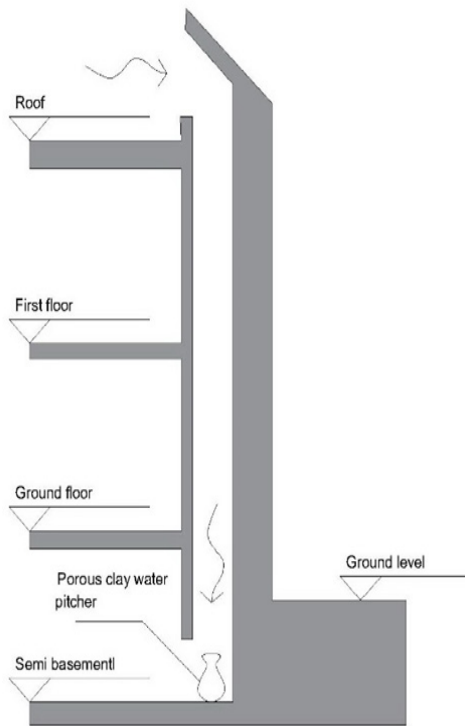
Cross-section of wind tower cooled by building mass (drawing by author).
